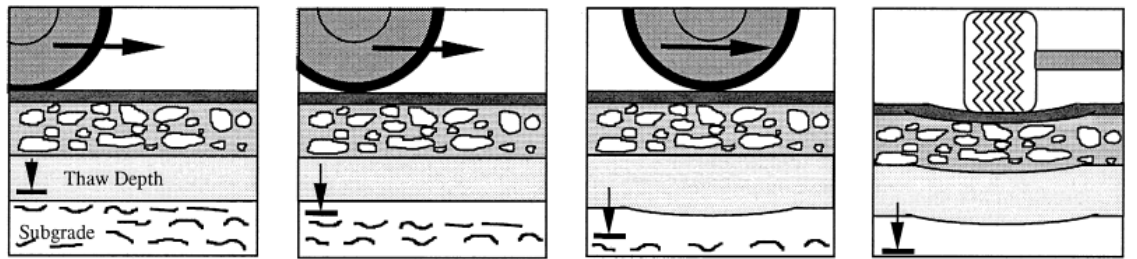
Damage to the pavement with a poorly drained structure (Simonsen, 1999).
